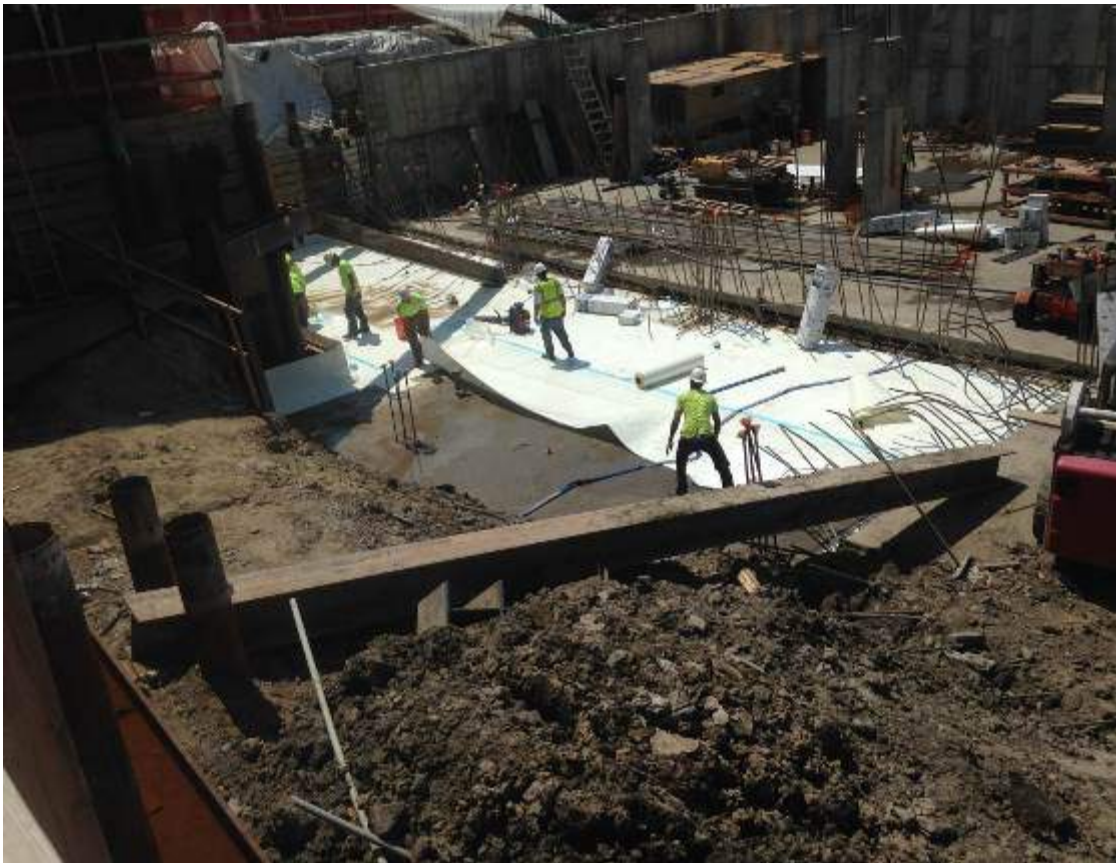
View of the excavation area in the northeastern portion of the Site, facing northwest.
